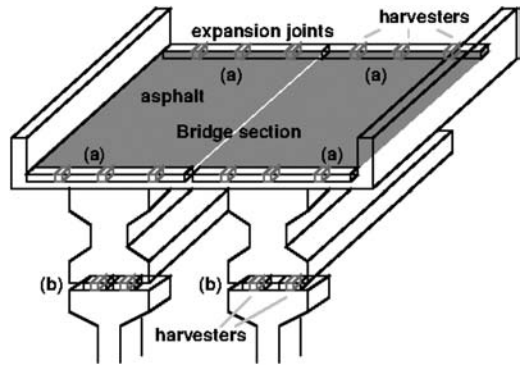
Sketch of a beam-column connection in a bridge with possible harvesters location sites.
